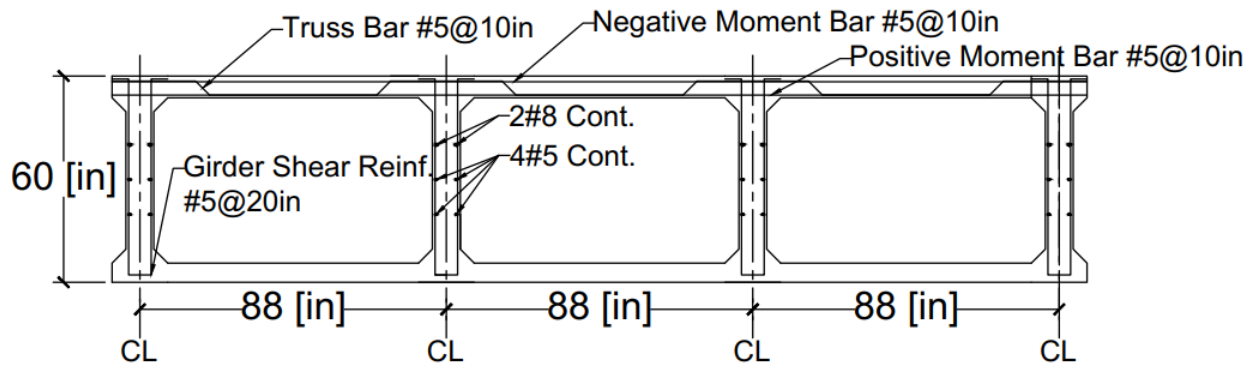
Simplified Cross Section of RC Bridge 02 0036L
